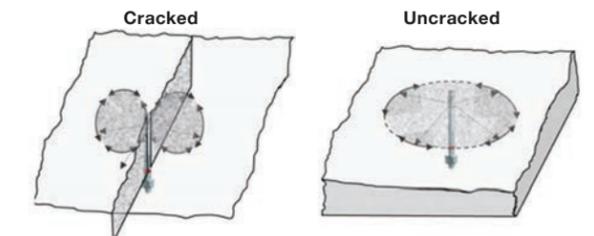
Concrete cone in cracked (left) and uncracked (right) concrete.
